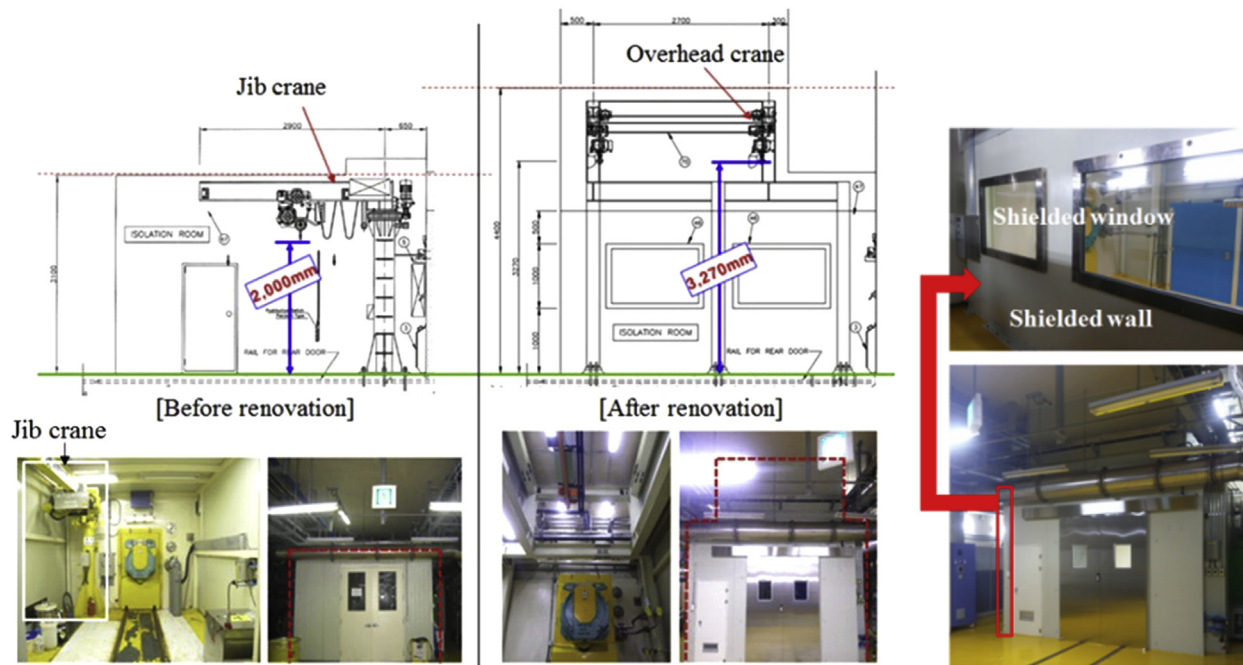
Renovated isolation room and changed structure of the crane system.
